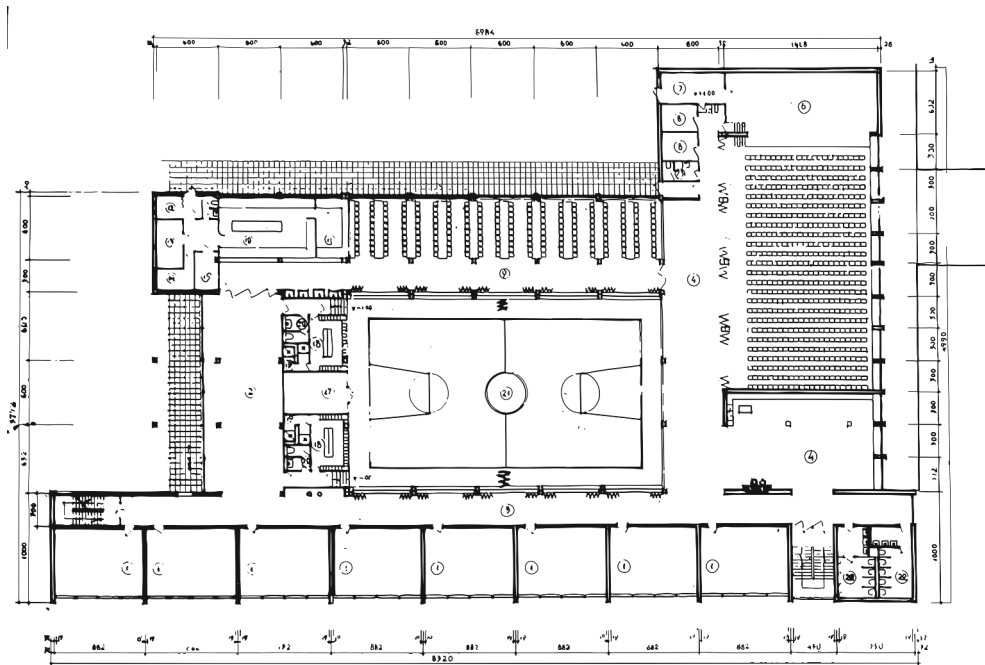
Halls were designed close to each other and the entrance lobby, so that it would be convenient to join the space and divide it into smaller spaces to be used after the school working hours. Ground level plan. Secondary School for 1392 students, 1966–69, architect Elena Nijolė Bučiūtė [source: Vilnius Regional State Archive].
